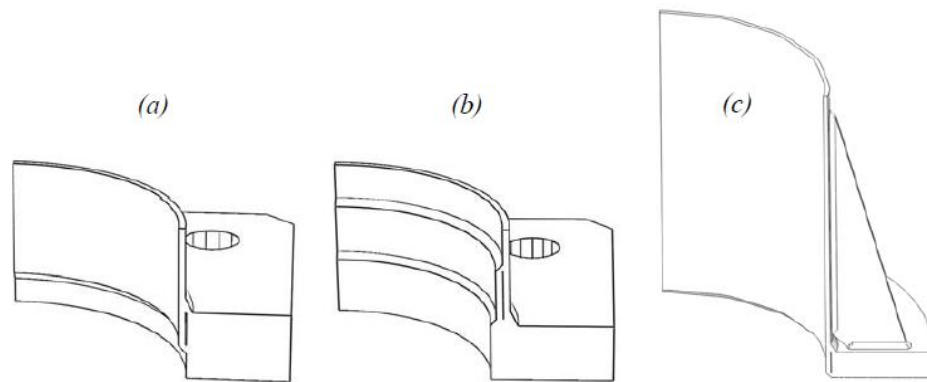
(a) Tube-to-base plate fillet-weld connection, (b) full penetration weld connection, and (c) stiffened fillet weld connection (Tompson, 2012)
